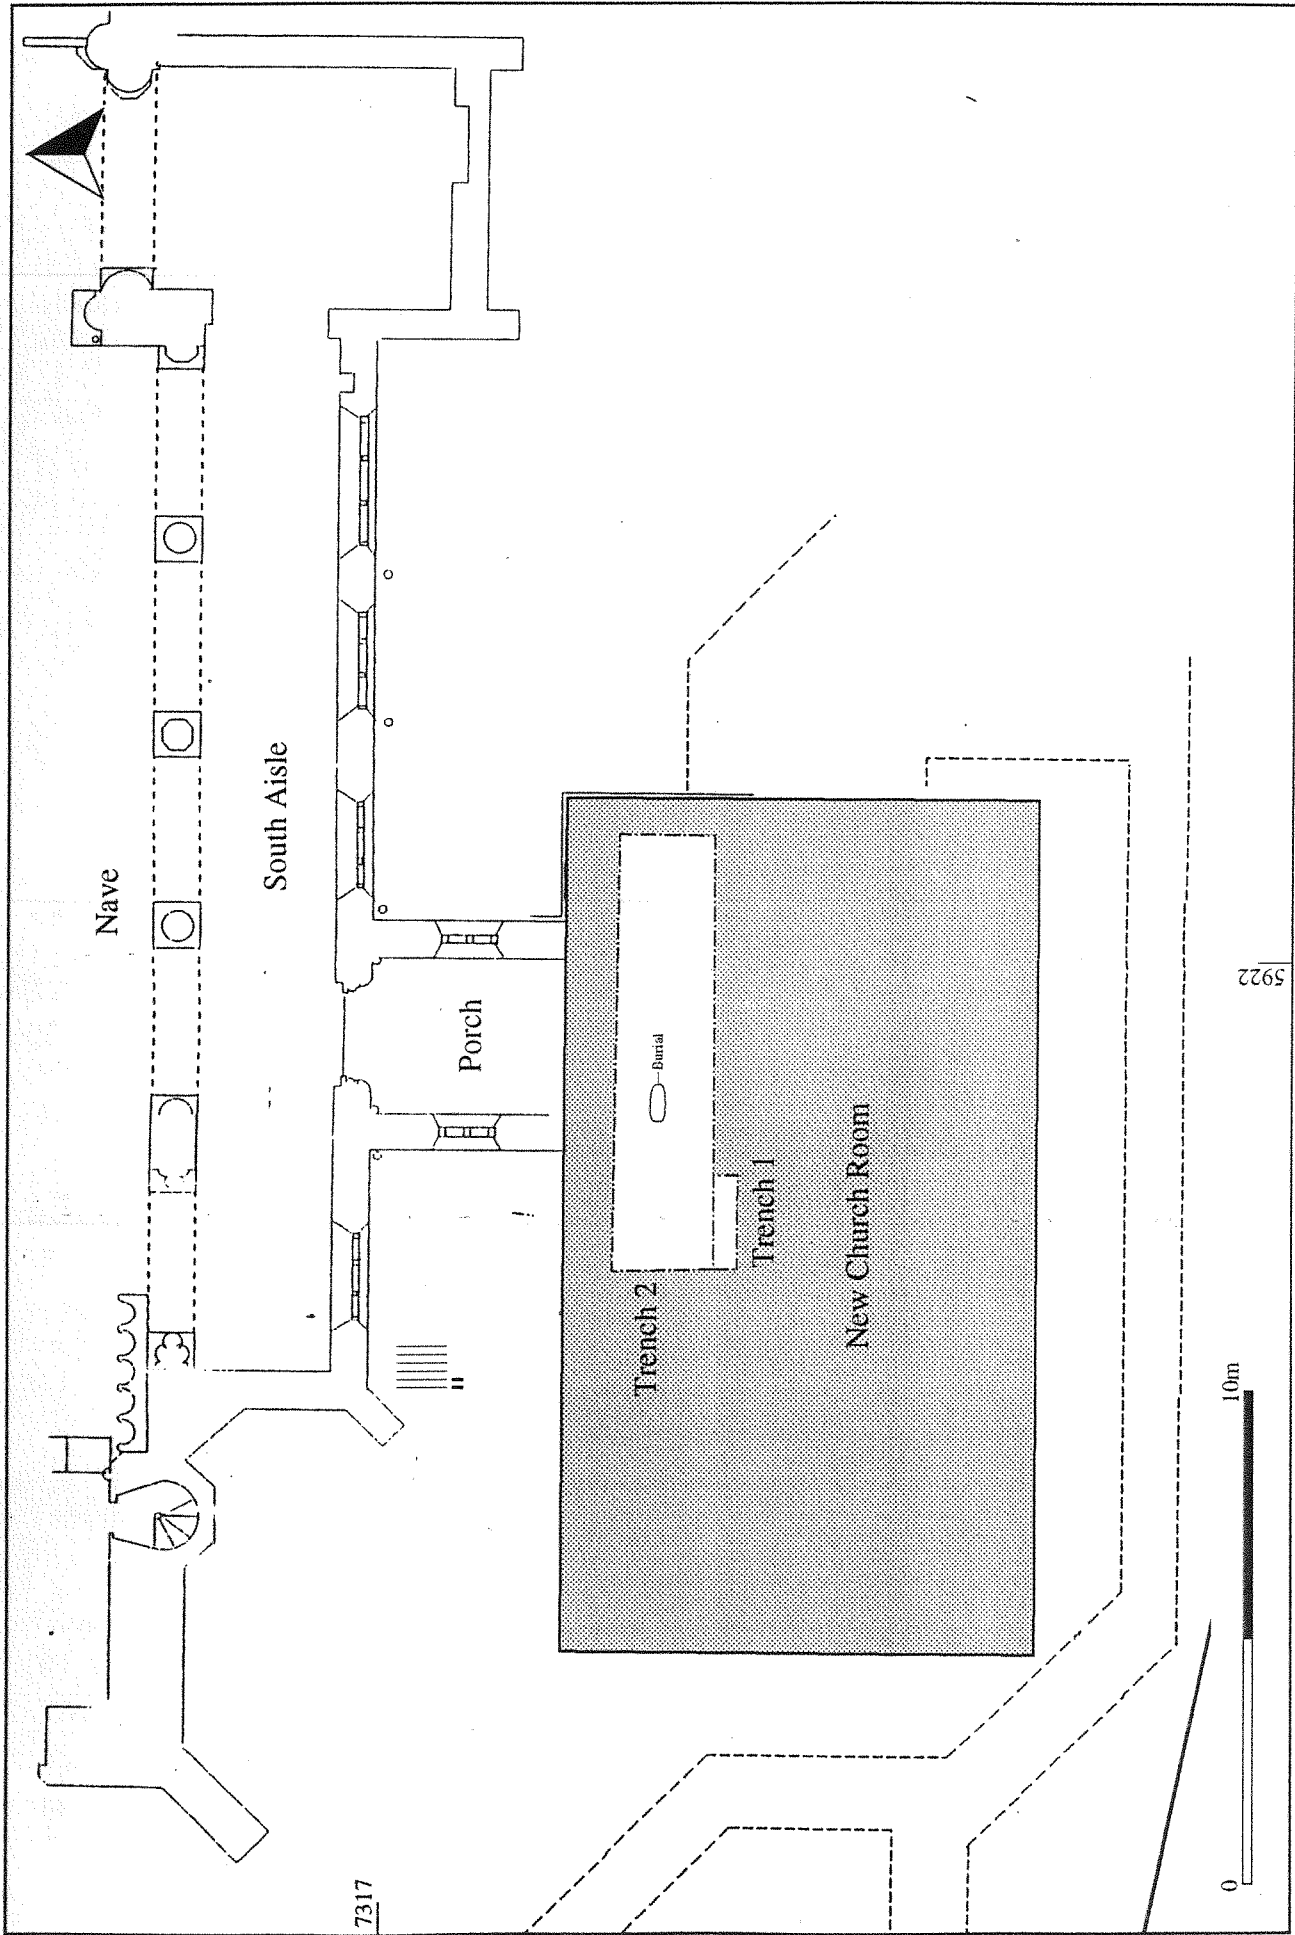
Plan showing the south side of St Andrews Church, the footprint of the new building and position of archaeological trenches
